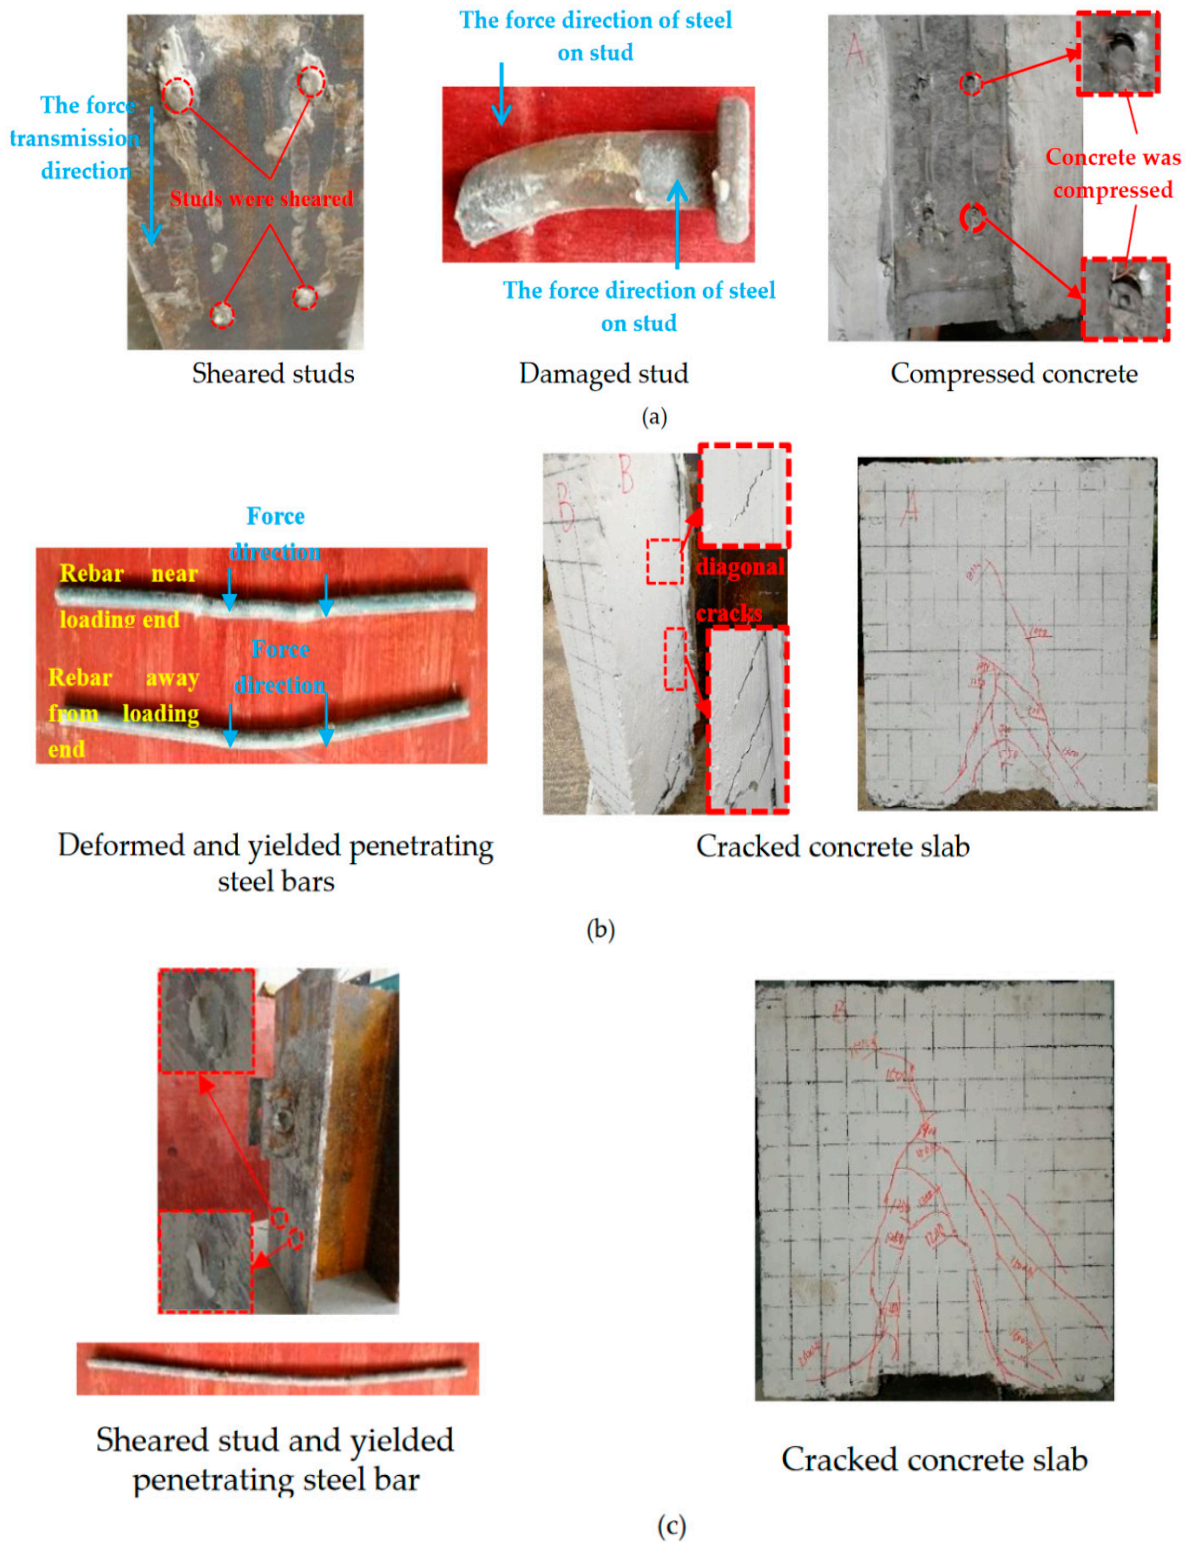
Typical failure model of push-out test specimens: (a) The failure details of LT-S specimen; (b) The failure details of LT-P specimen; (c) The failure details of LT-C specimen.
